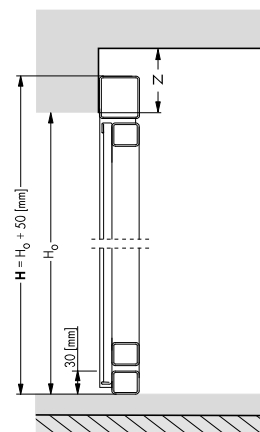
Installation behind the opening - vertical section (Komfort, Select, Connect).
